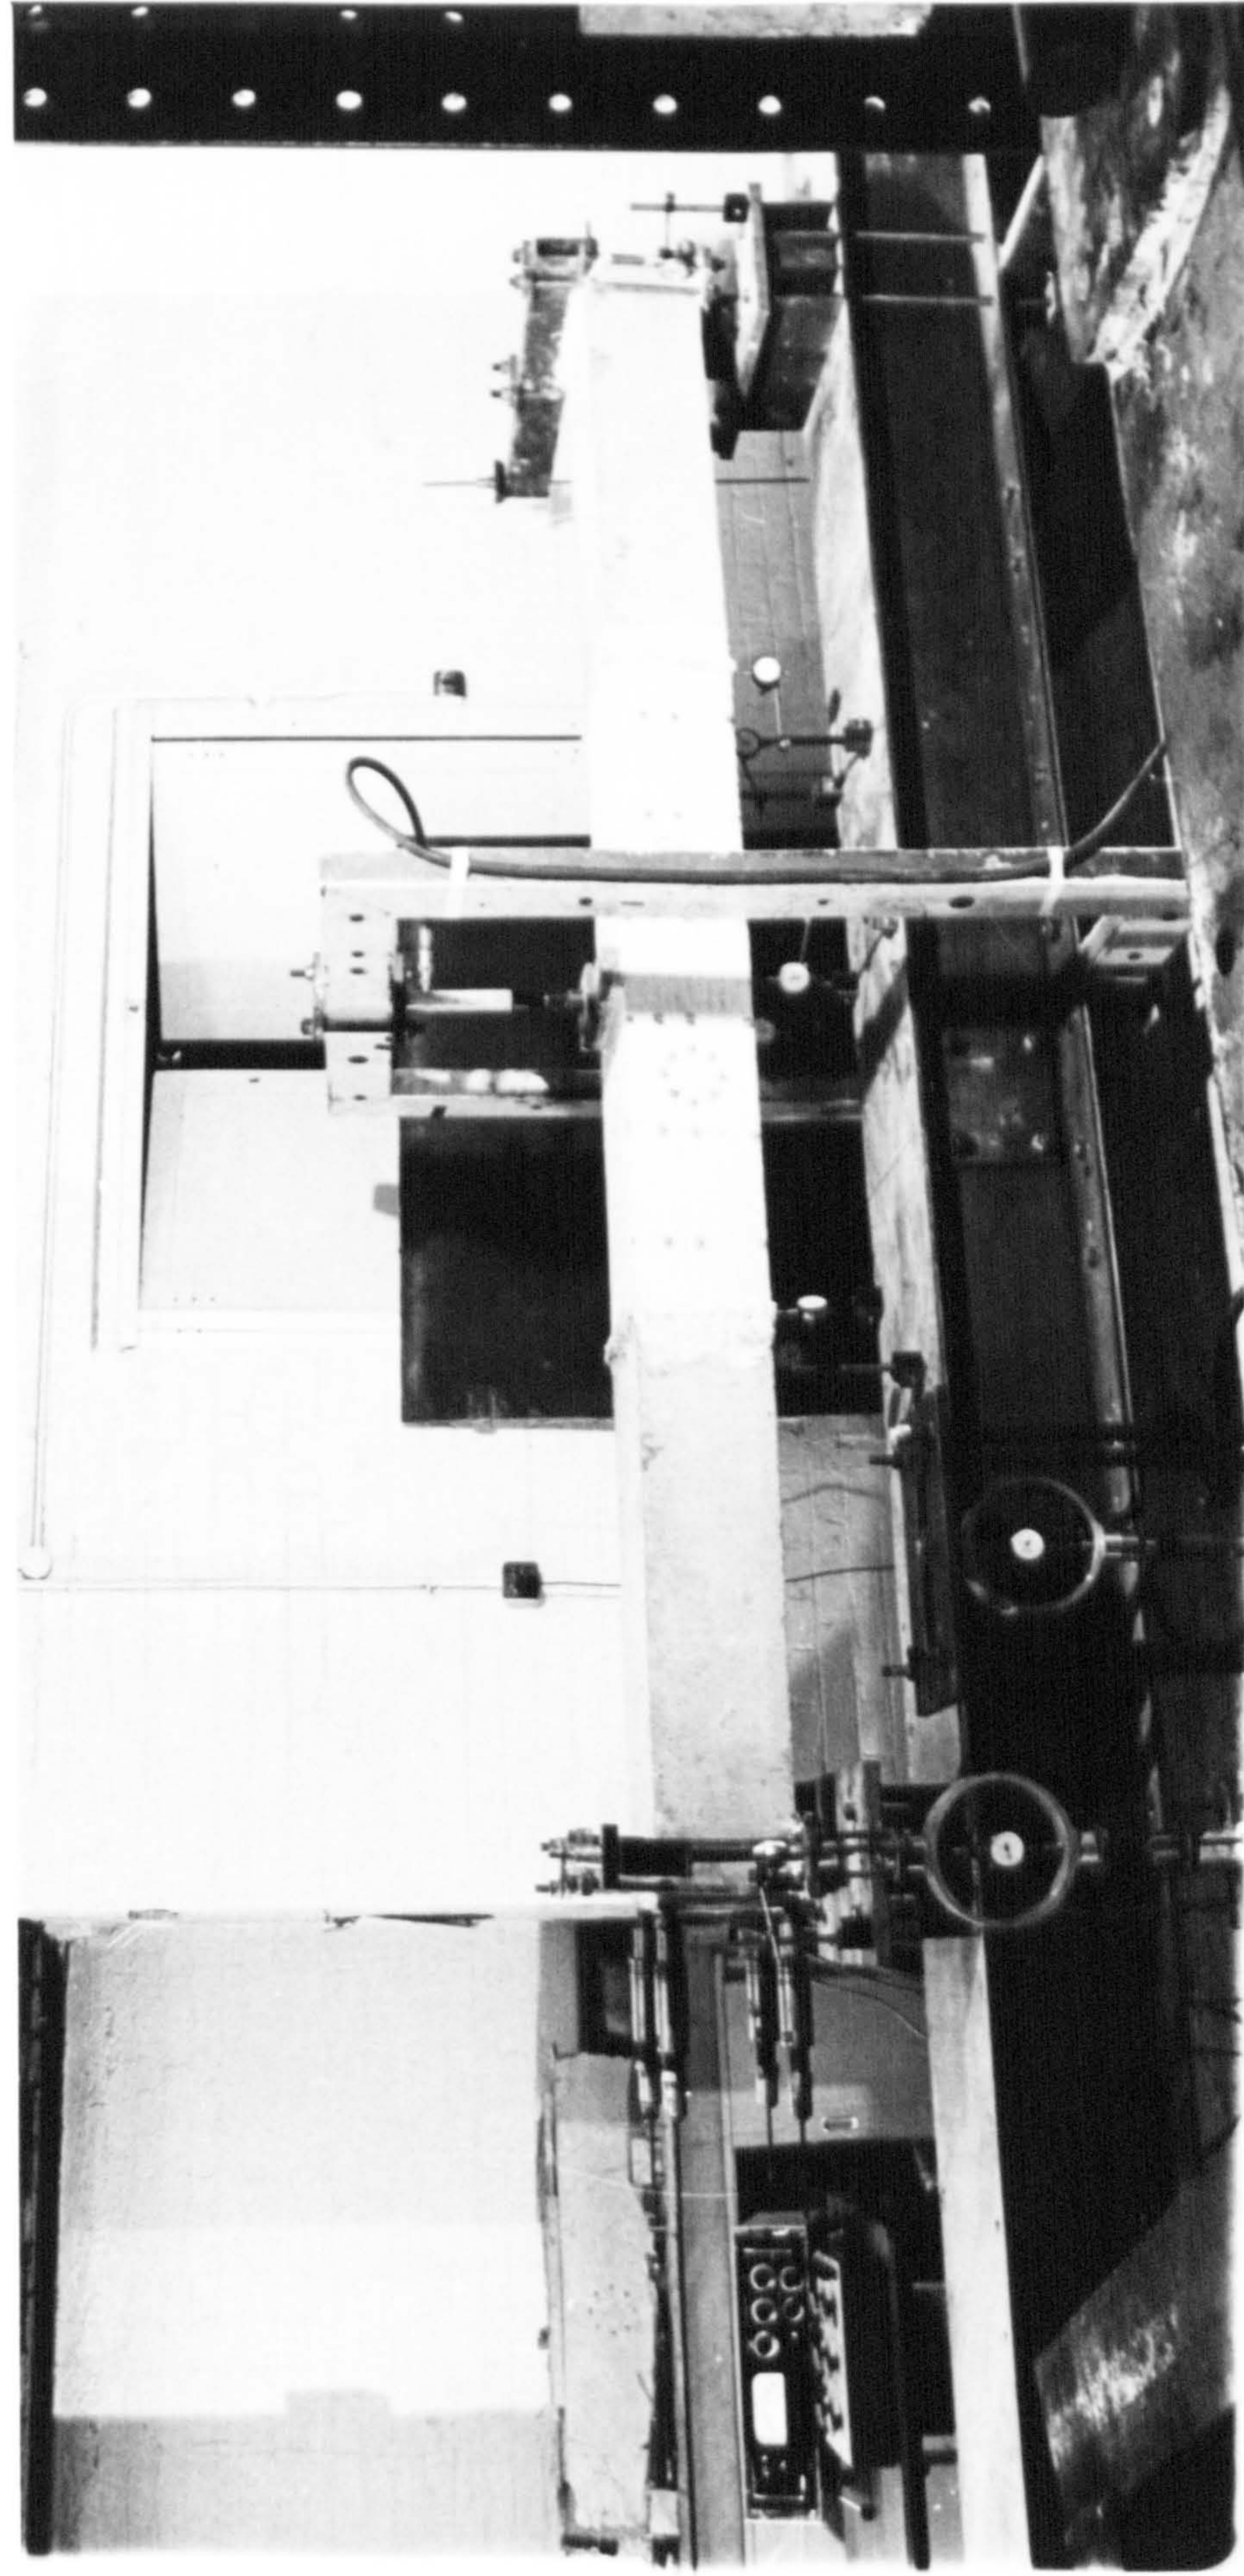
Test Arrangement used for Beams of series 2 & 4.
